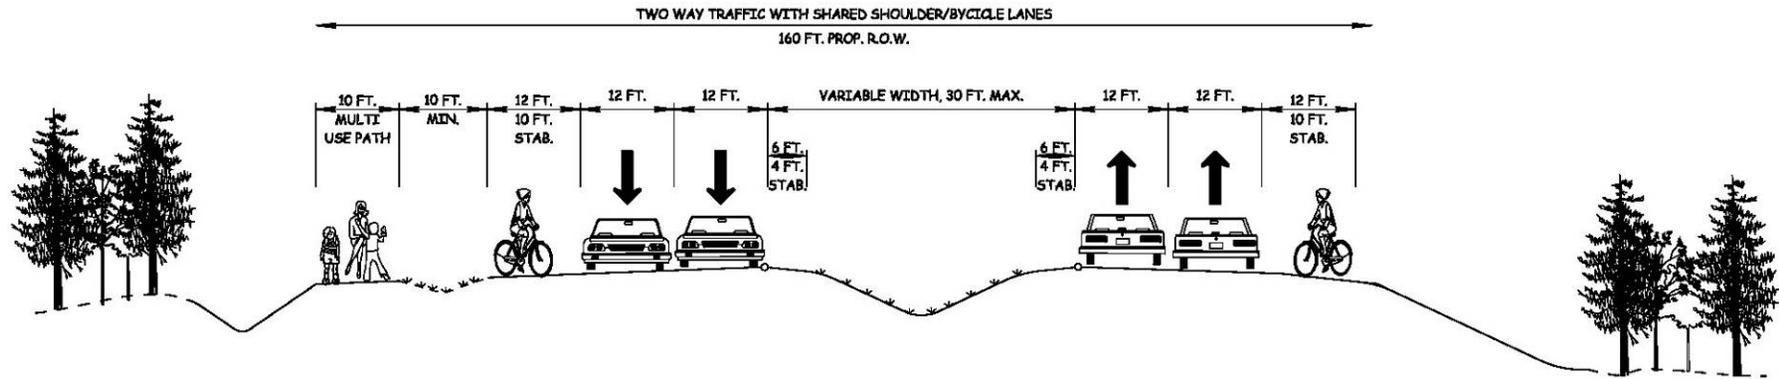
CHELSEA AVENUE TO WOLF RIVER BRIDGE CROSS SECTION
